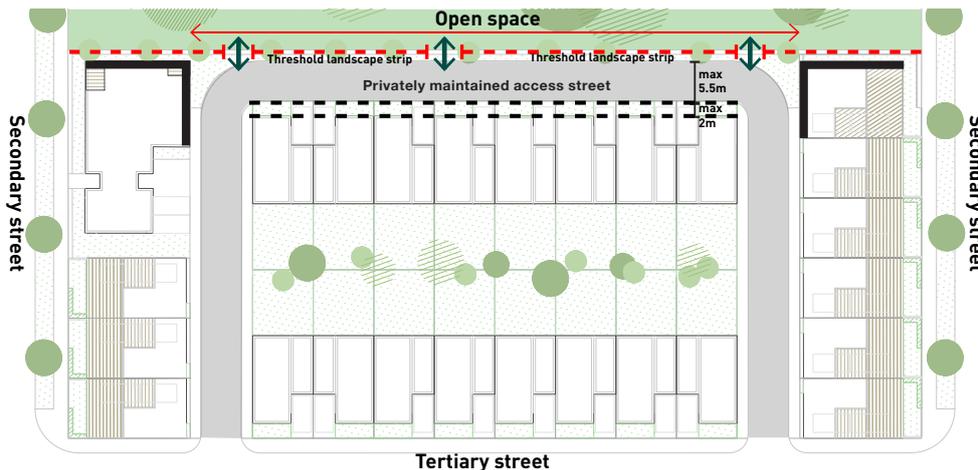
Typical arrangement of a privately maintained access street next to an open space
